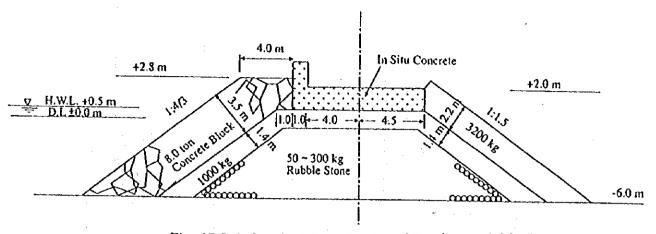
Standard Cross Section of Breakwater (-6.0m)
